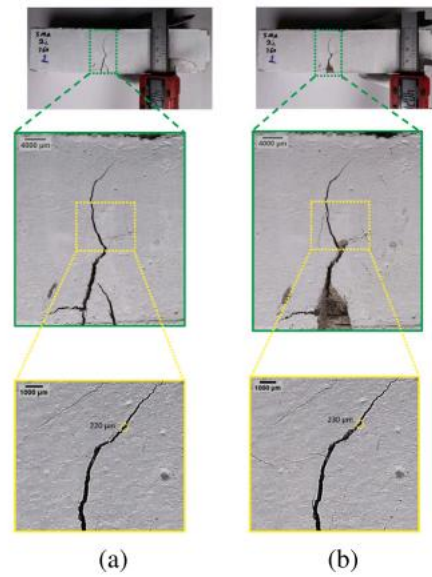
Crack opening in a specimen with Fe-SMA fibers: (a) before heating, (b) after heating.
